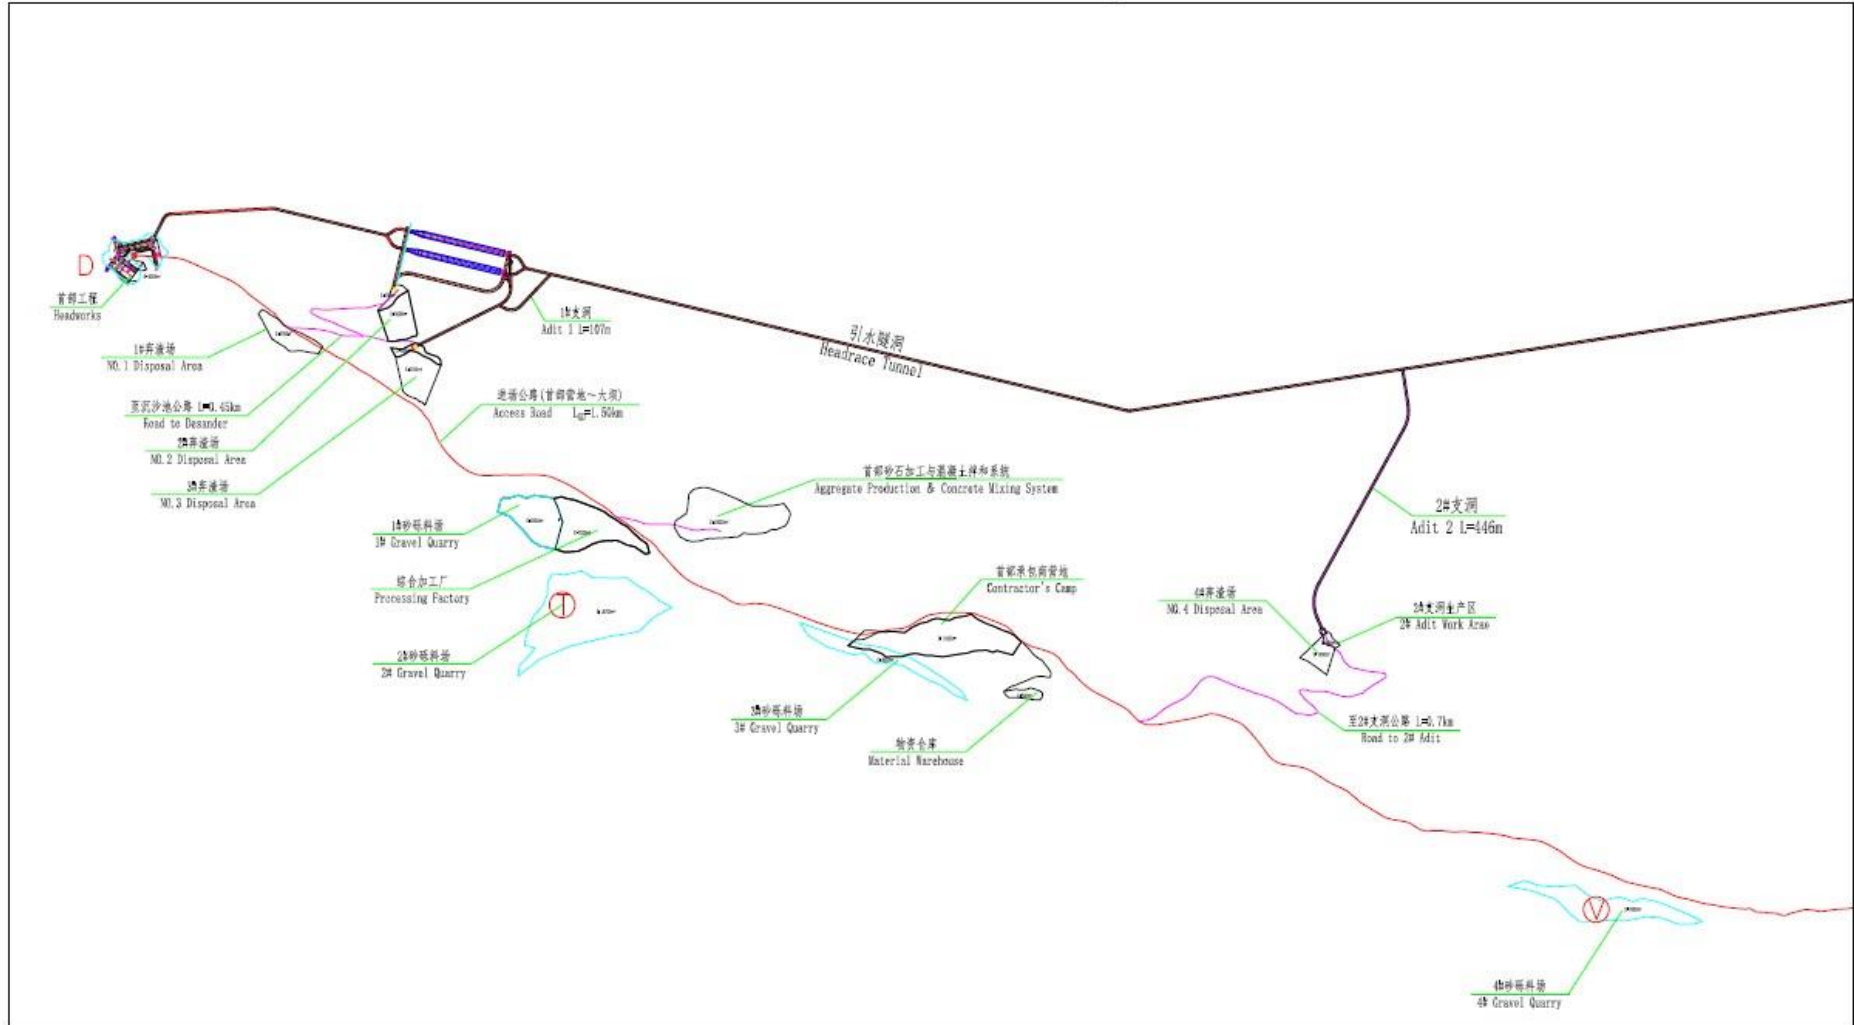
General Project Layout (Source: Detail Design Report 2021)
